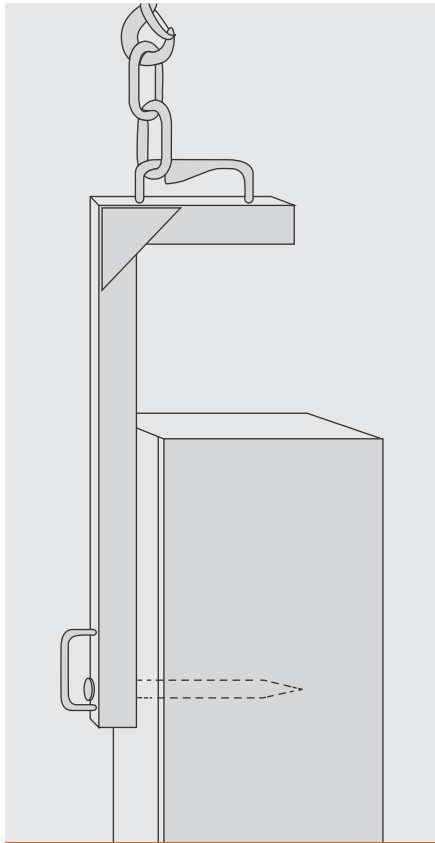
Lifting hook (Hebel® vertical wall panels).
